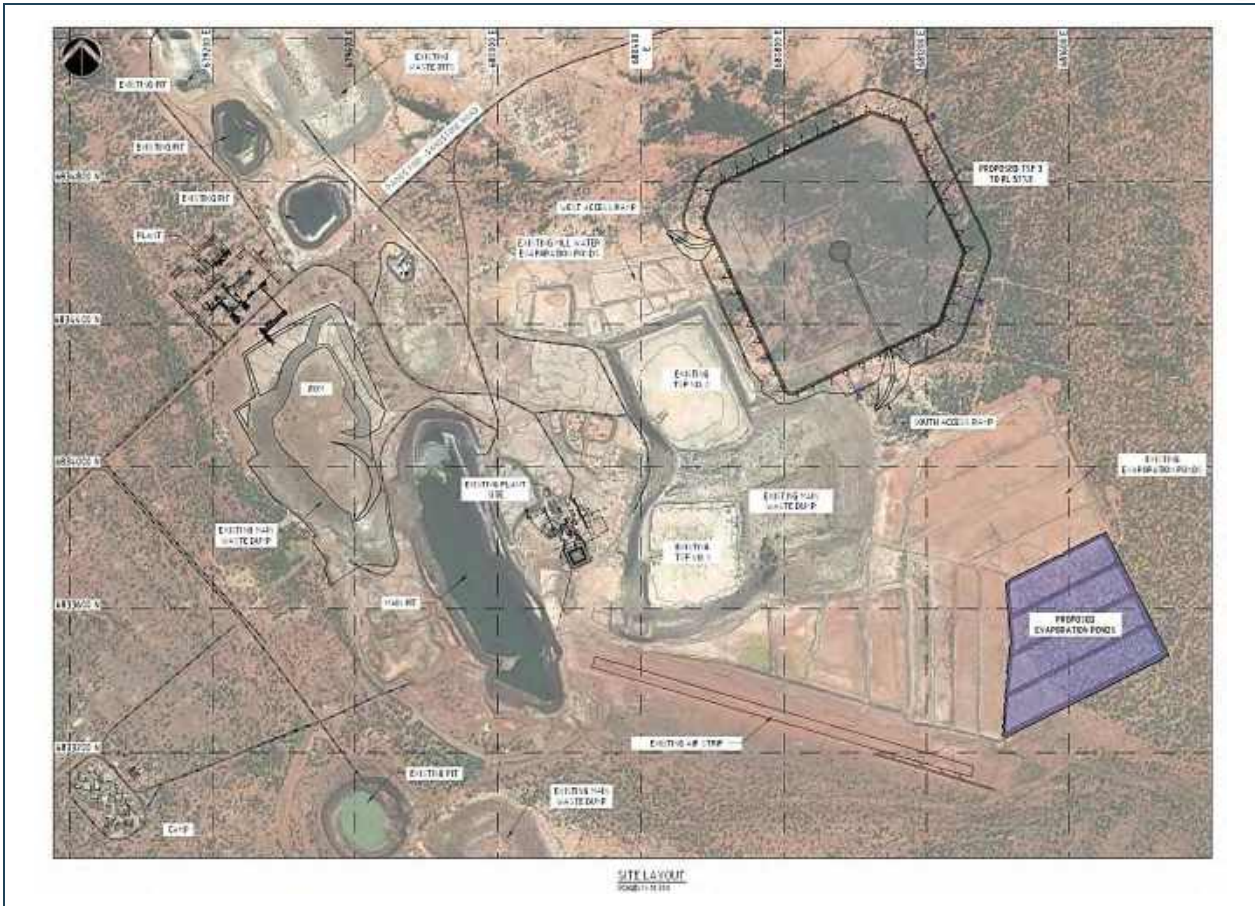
Youanmi Existing Mine Layout and Proposed Evaporation Pond Extension in Purple (TailCon, 2025)
